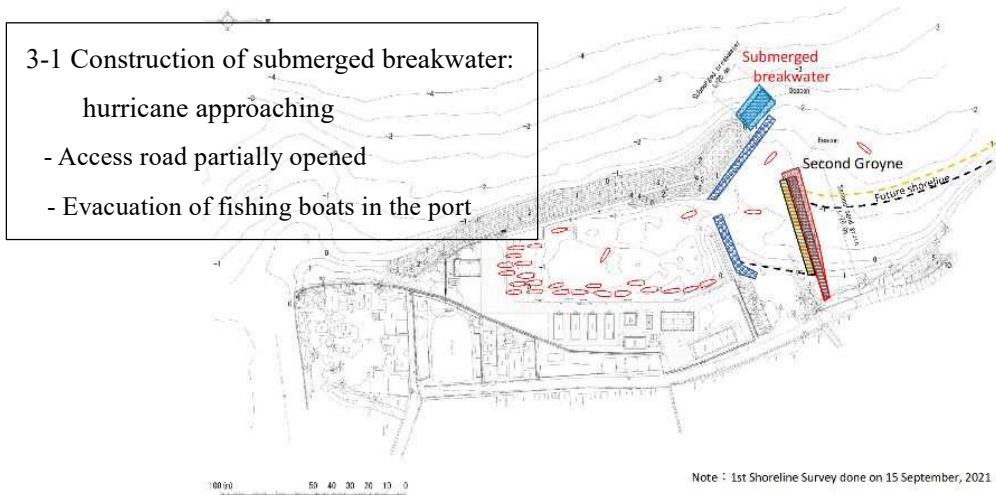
(3') In case of hurricane approaching during construction of submerged breakwater (construction phase and minor improvement work)
